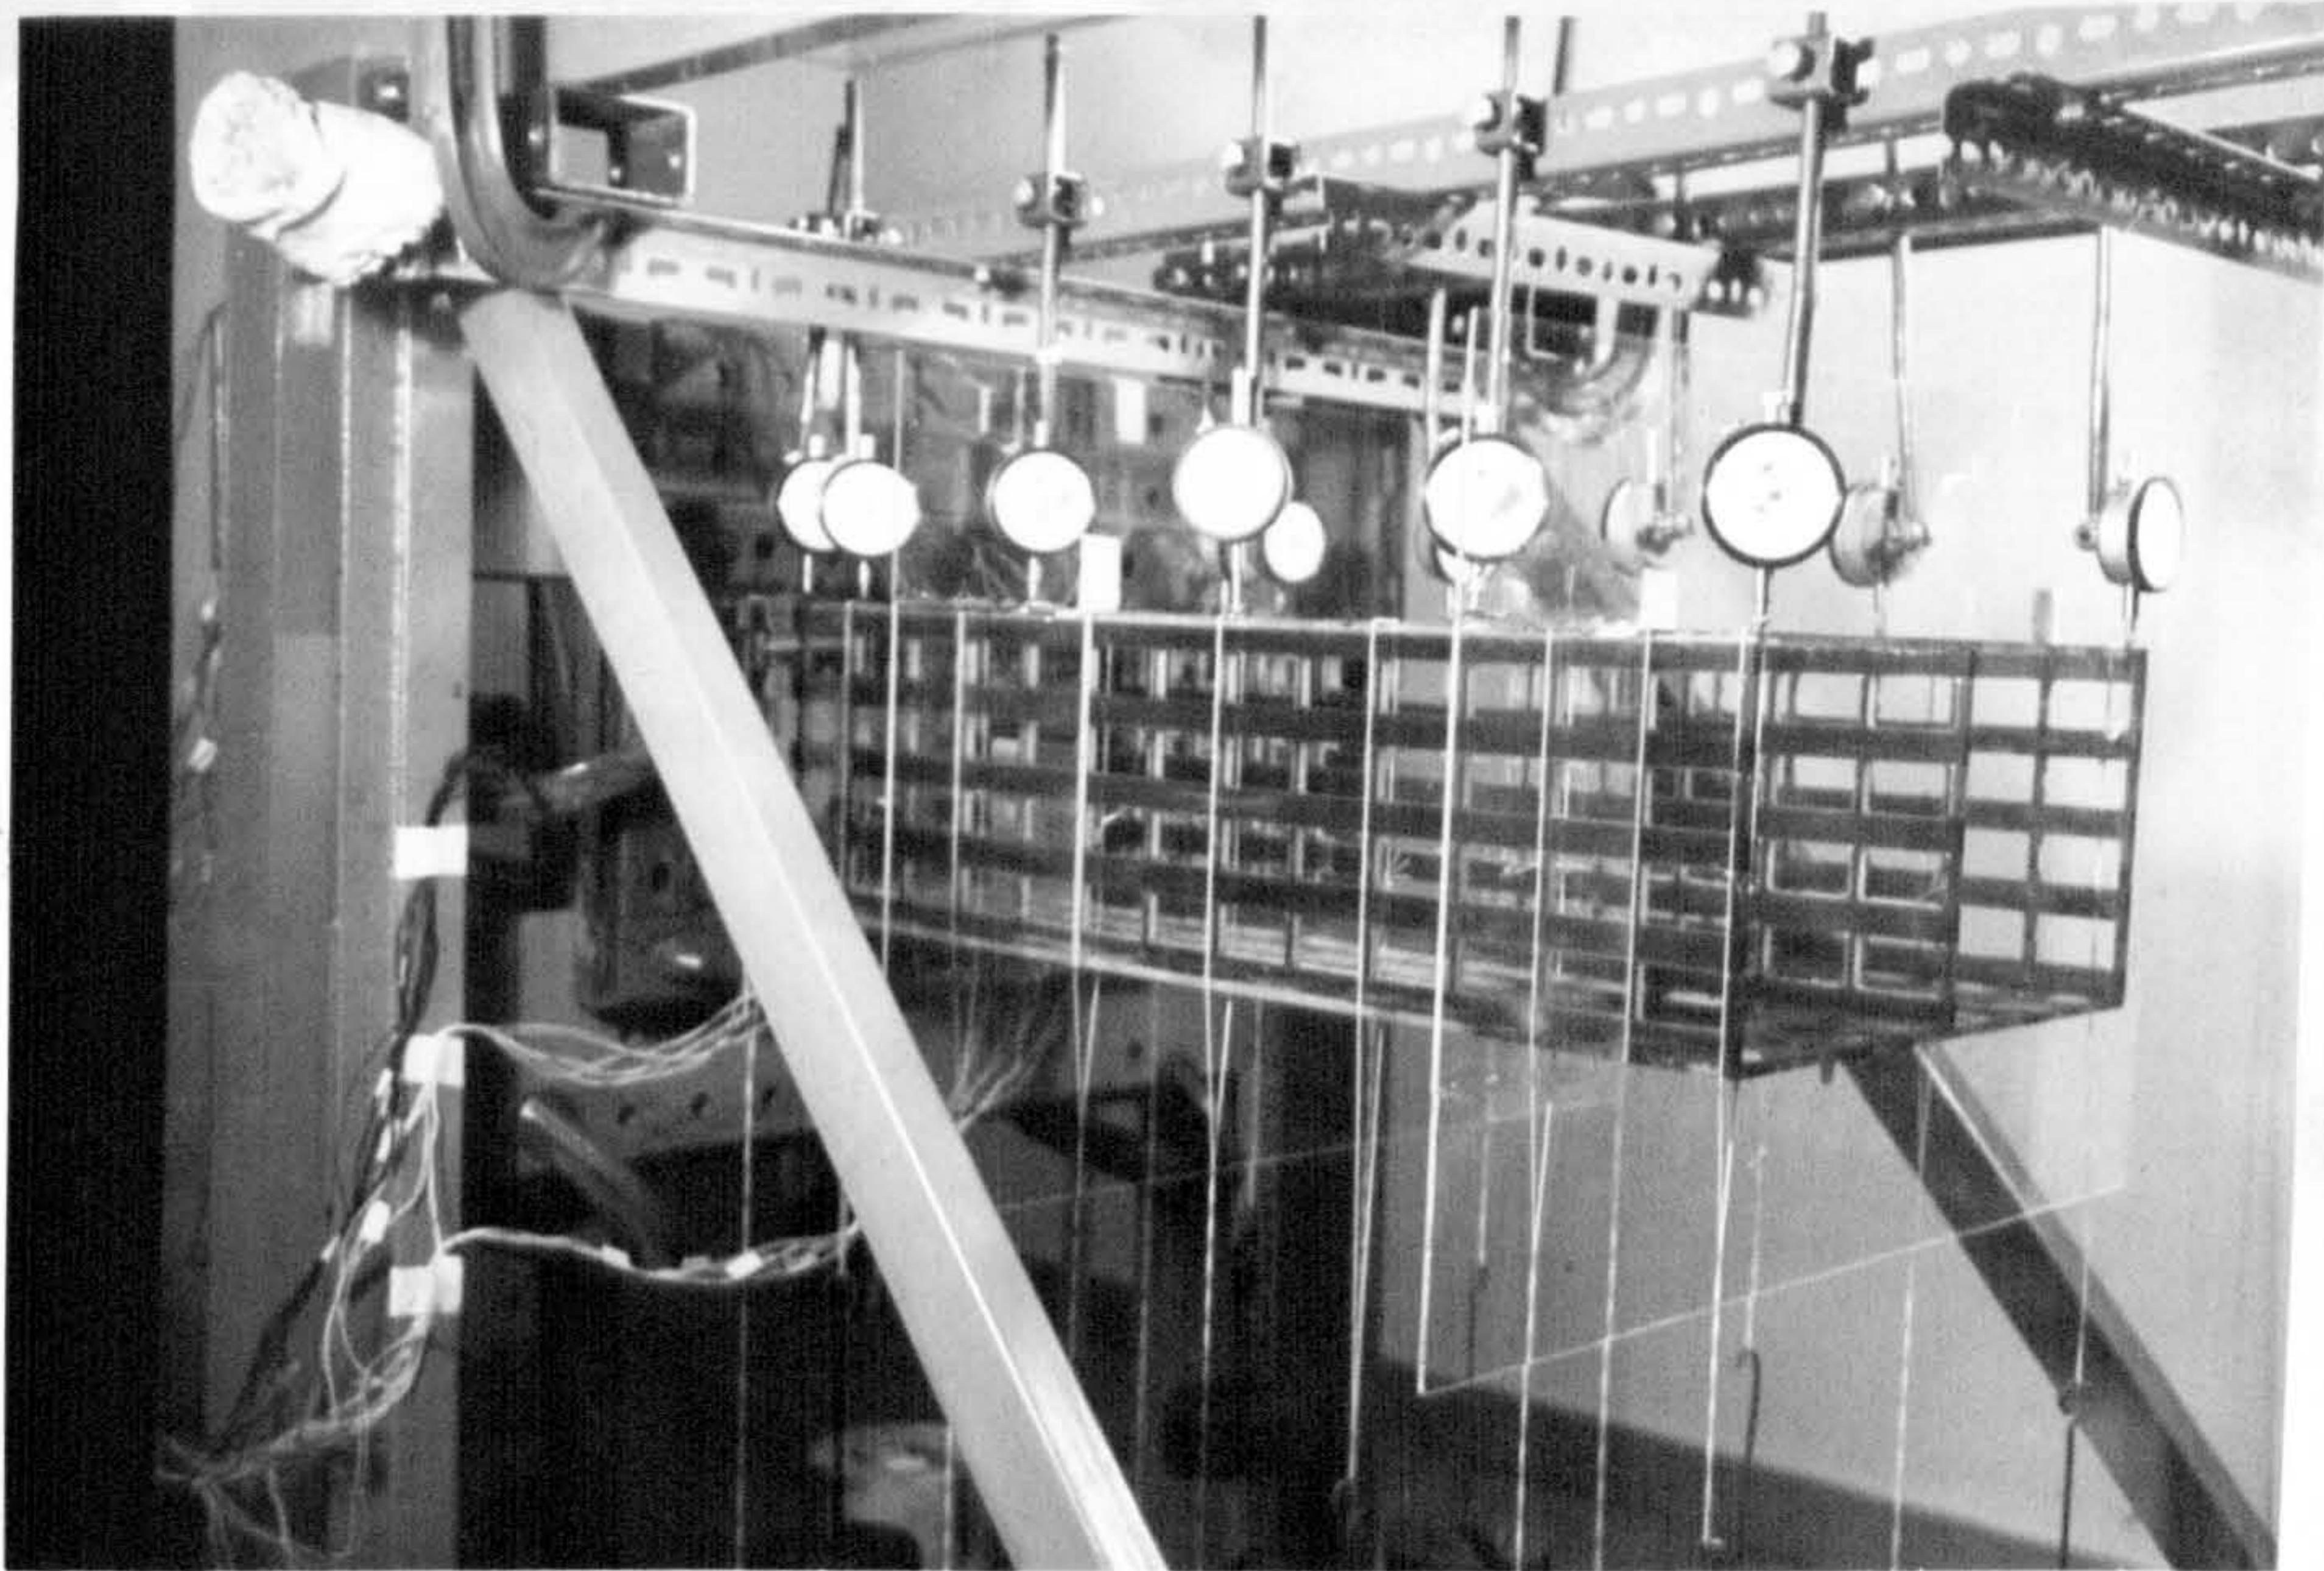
Bundled-tube model showing fixing arrangement at the base
